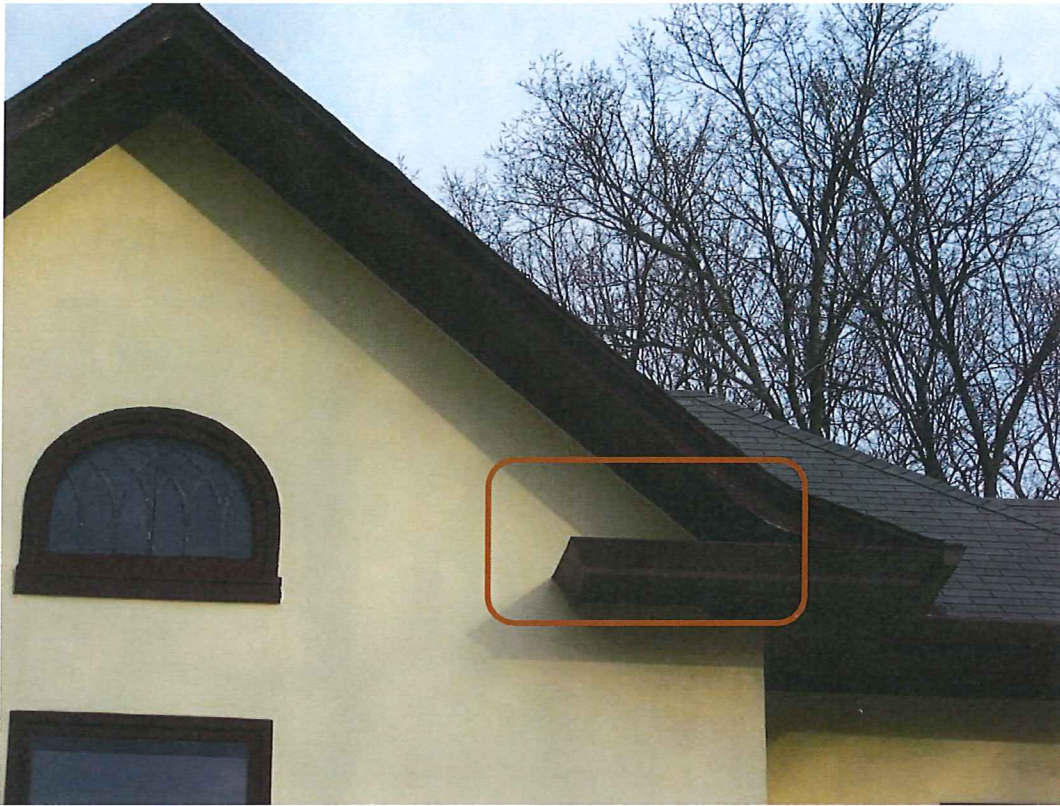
848 Spaight Street – area of proposed eyebrow (right)
